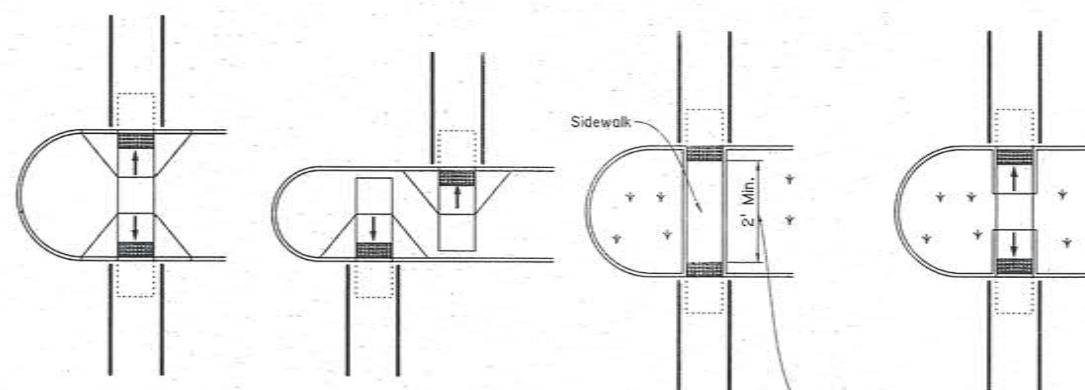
DETAIL E: CURB RAMPS PLACED AT MID-BLOCK CROSSING
